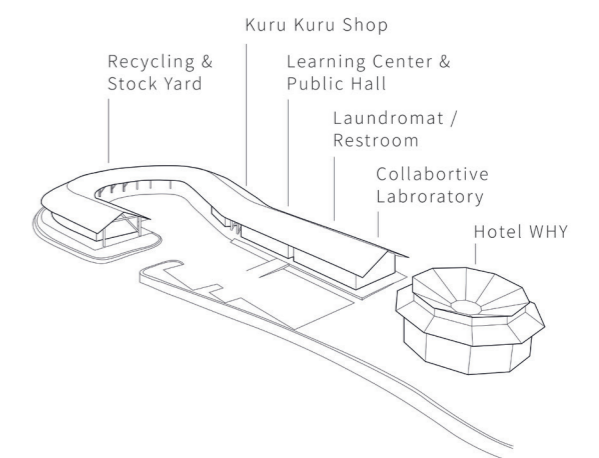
Room configuration over Kamakatsu's Zero Waste Center.
